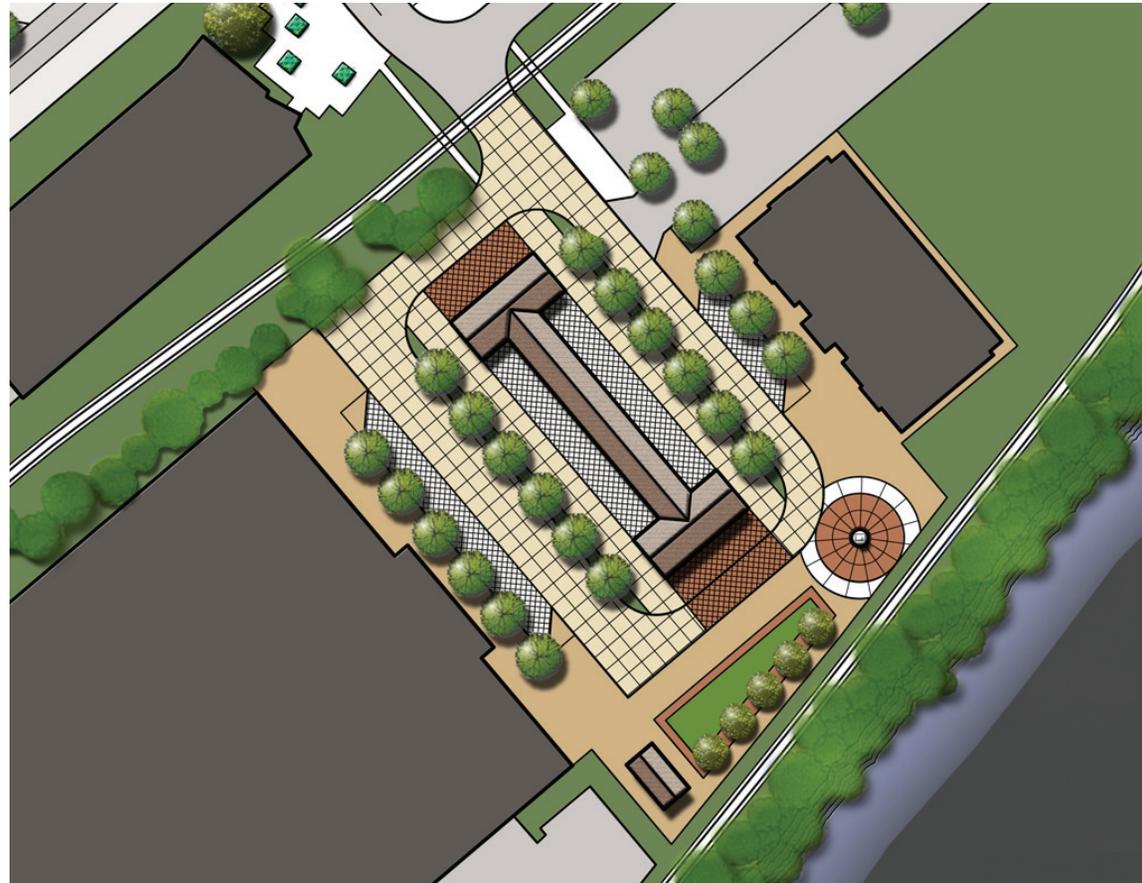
This plan illustrates the transformation of the existing green space between the Post Office and ELM into a public plaza and civic building.
